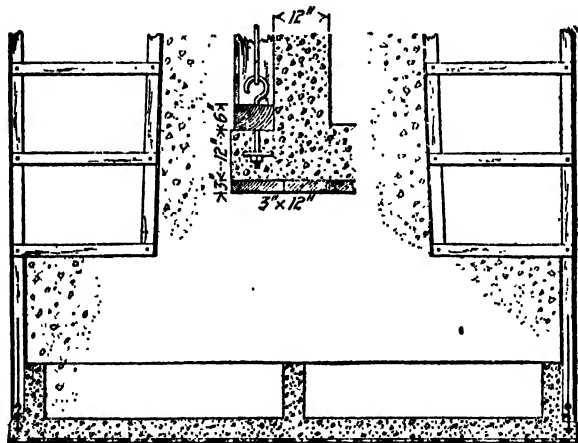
Movable Cofferdam on Concrete for Bridge at Portland, Me.
